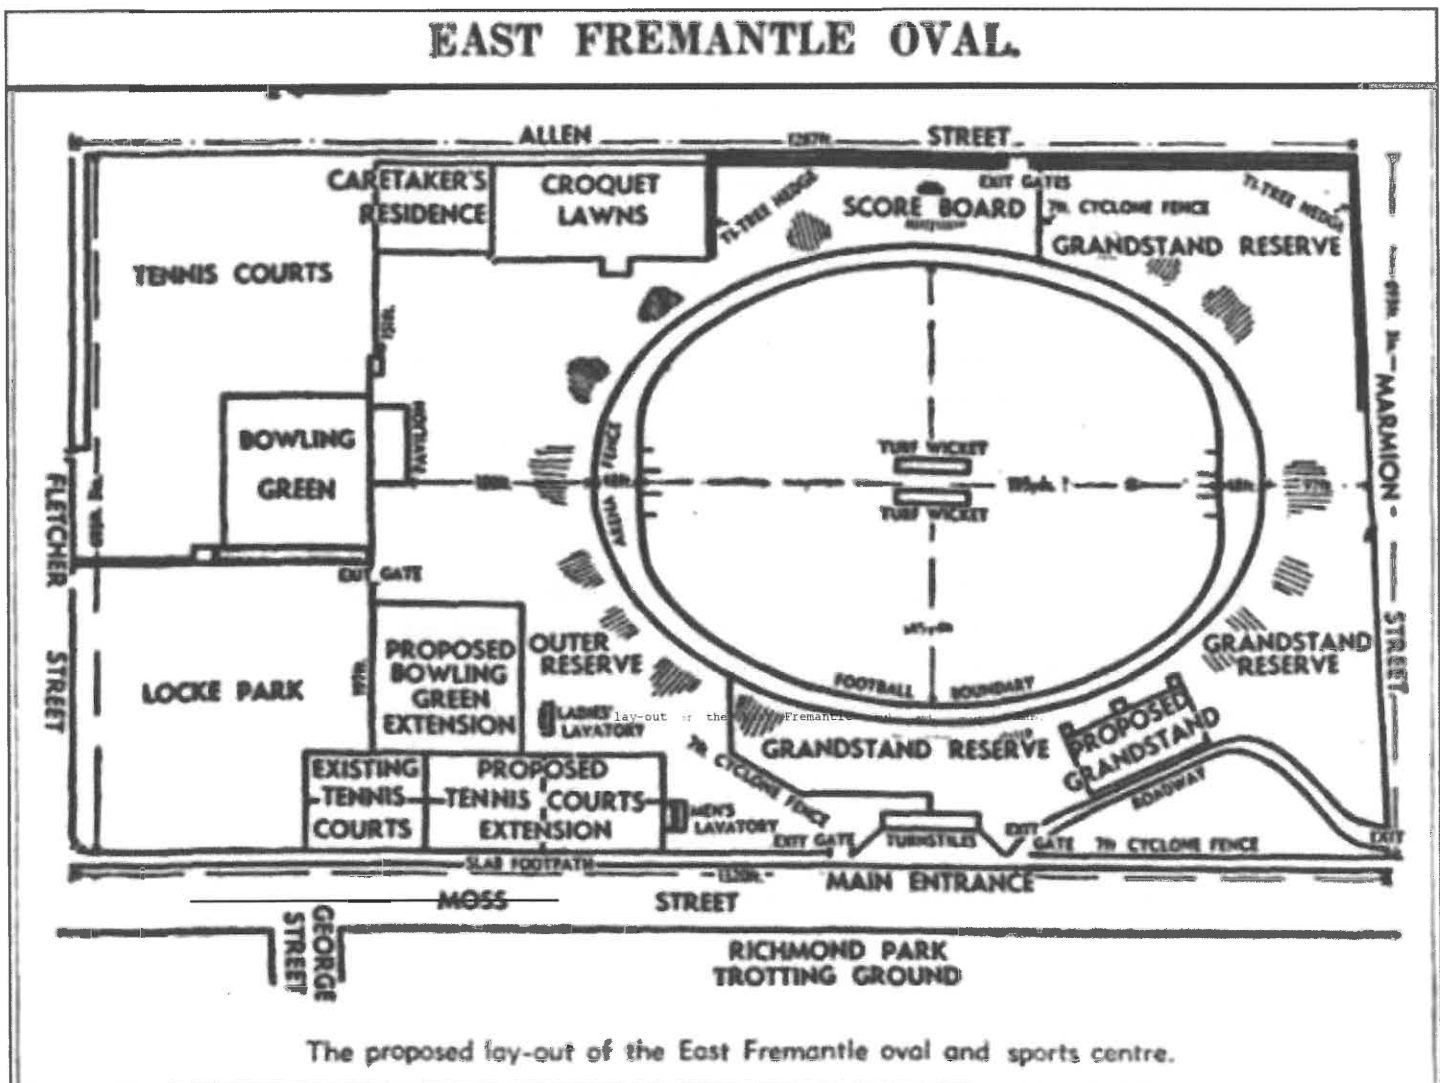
Historic Site Plan (The West Australian Thursday 8 August 1946 p3
